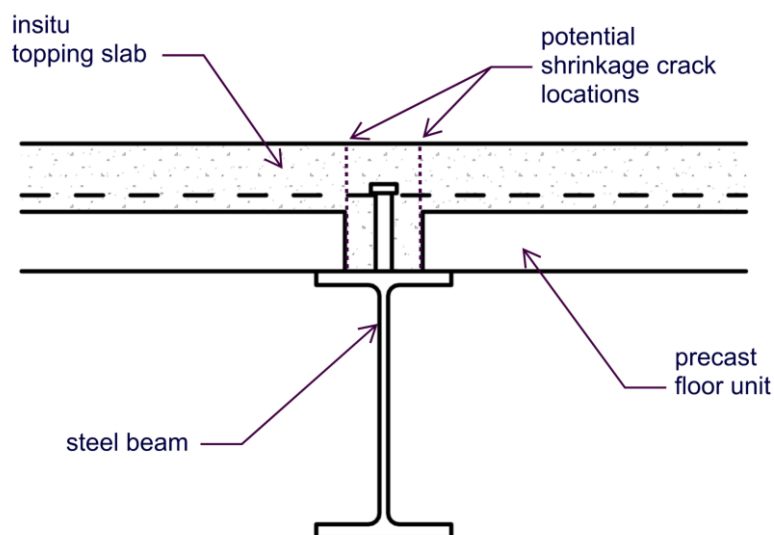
Cross section of composite steel beam supporting precast concrete floor units
